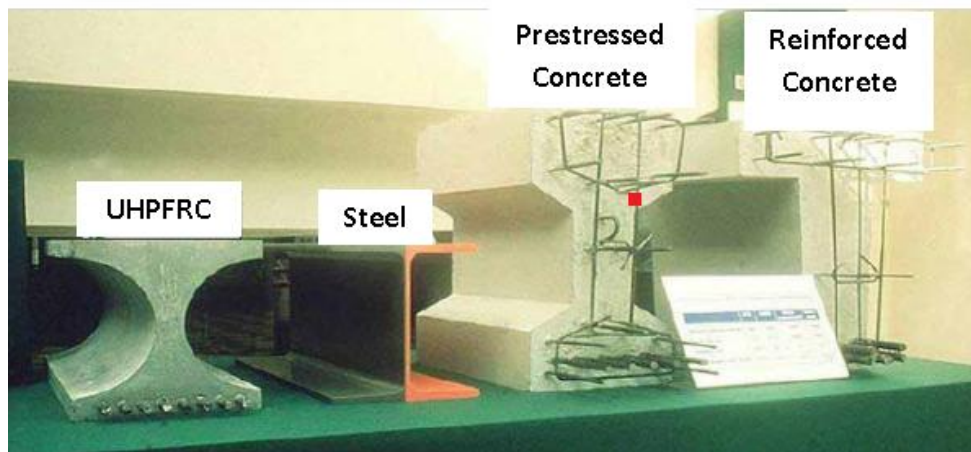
A UHPFRC, steel, prestressed, and reinforced concrete beams with equal moment capacities (Voort et al. 2008).
